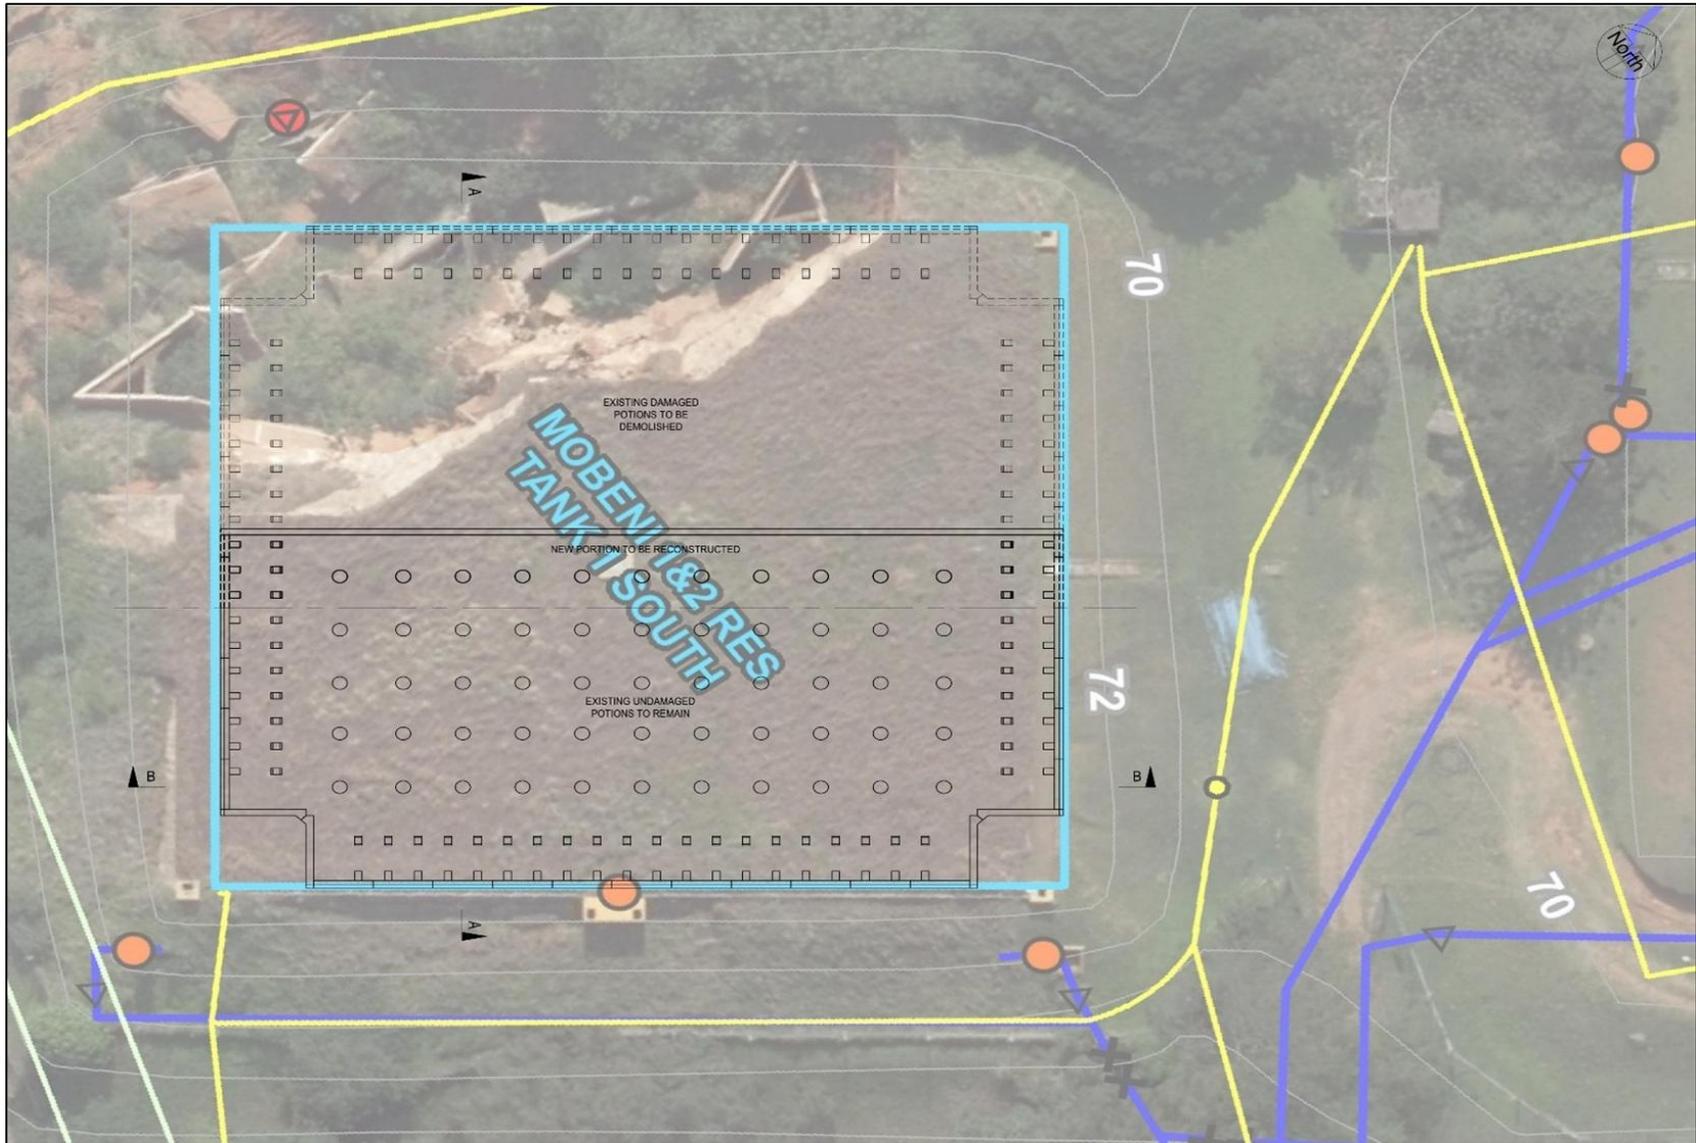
Plan View - Proposed Reinstatement of Reservoir No 2: Damaged portions to be demolished and new section to be built
